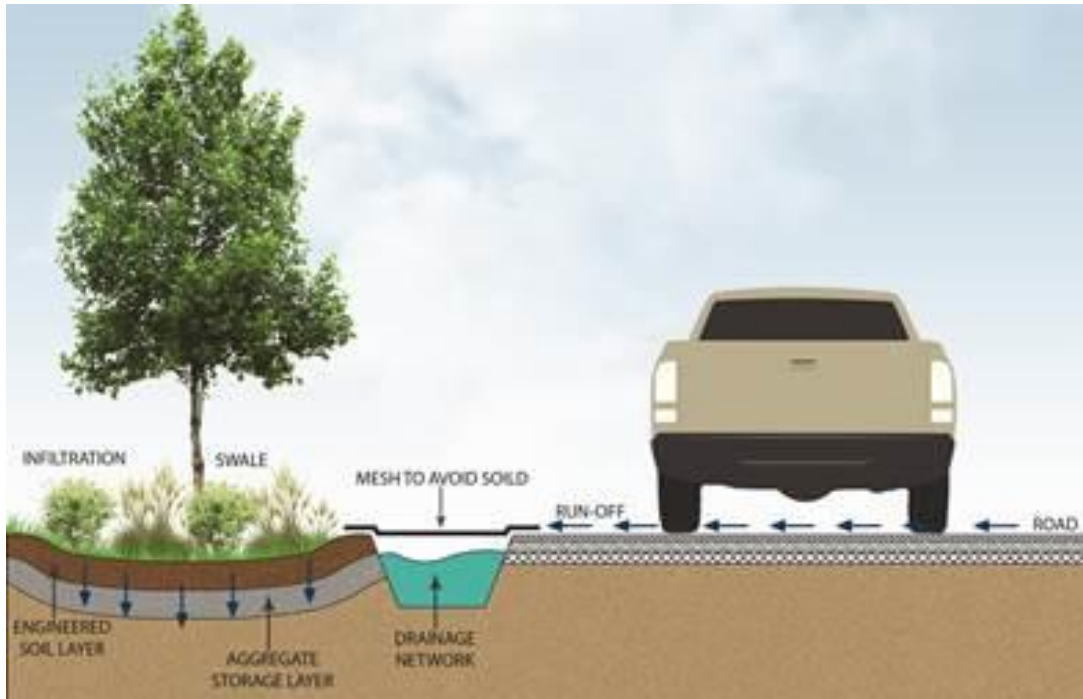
Swales to replace median along all major roads (Sectional Elevation)
